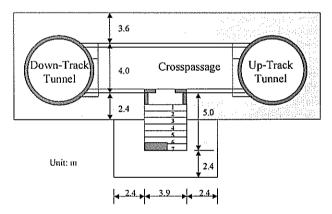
SJM treatment for excavation for the crosspassage and the sump
